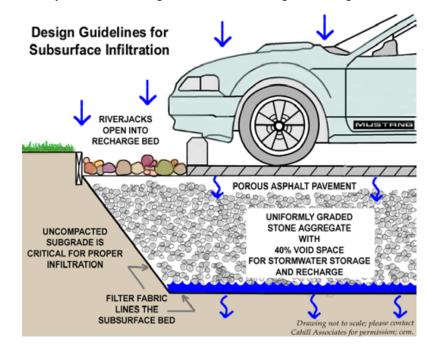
Profile of porous pavement parking facility (Penn. DEP, 2005)
